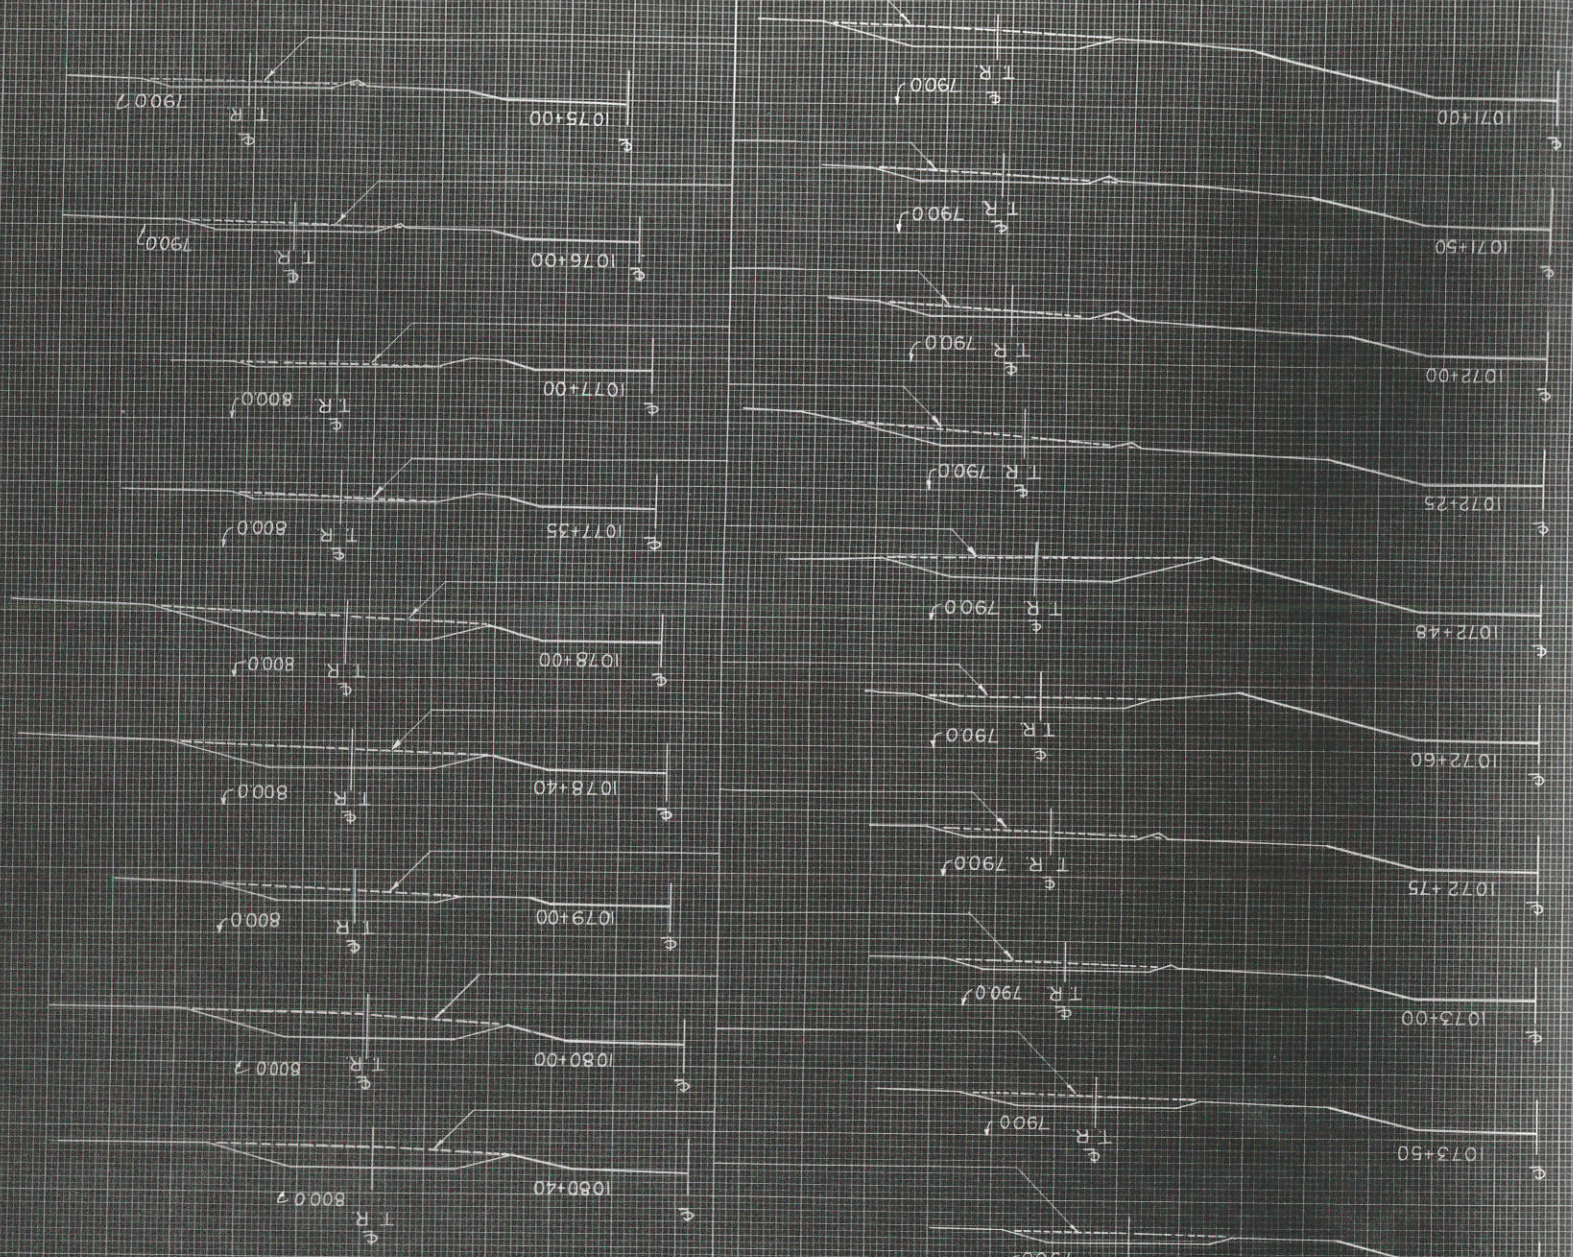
CROSS SECTION O.M.S. & STANDARD
